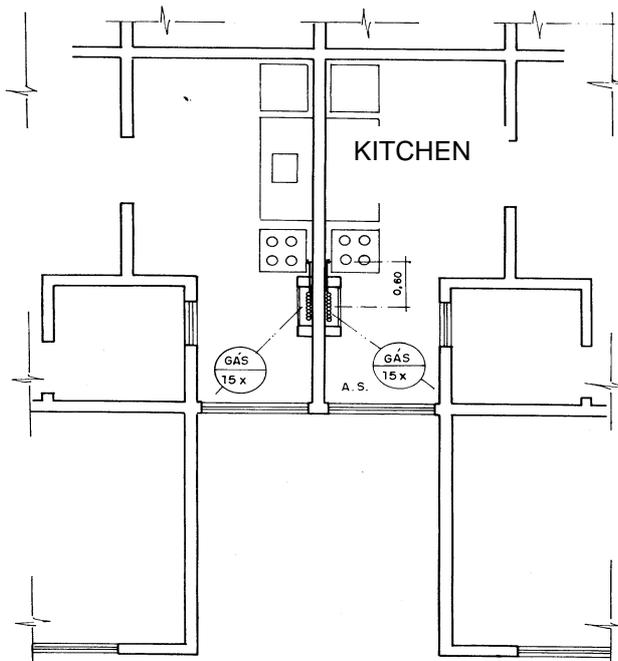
TYPICAL PAVEMENT GAS INSTALATIONS – TRADICIONAL SYSTEM
